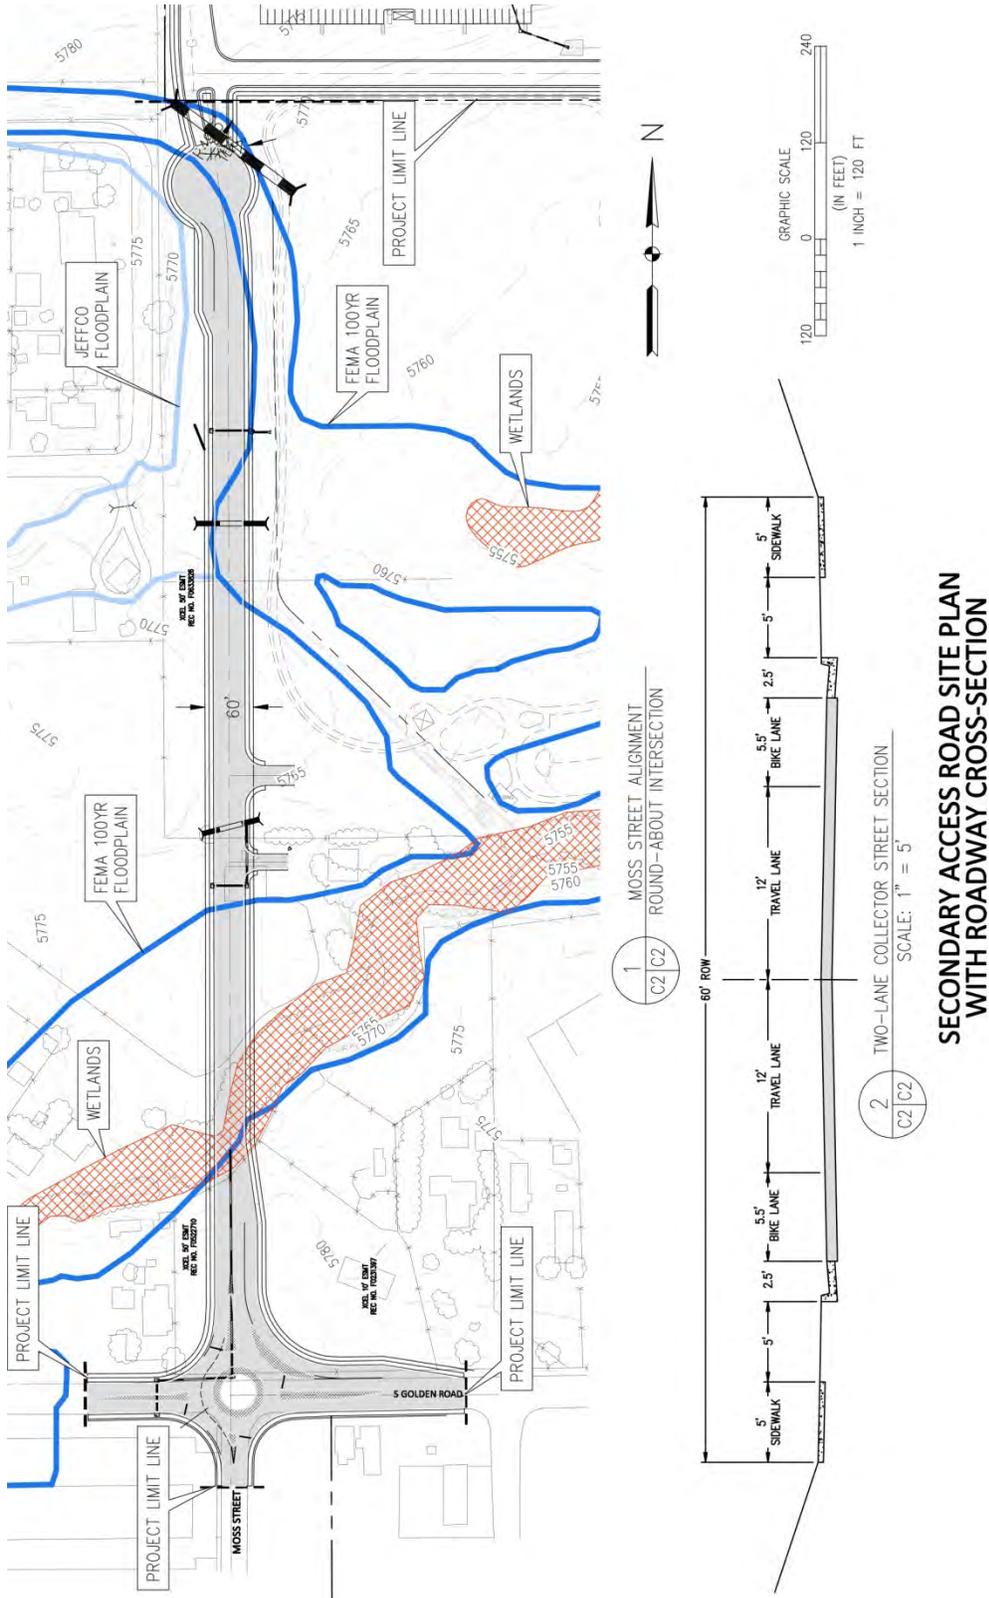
Second Access Road Site Plan with Roadway Cross-Section
